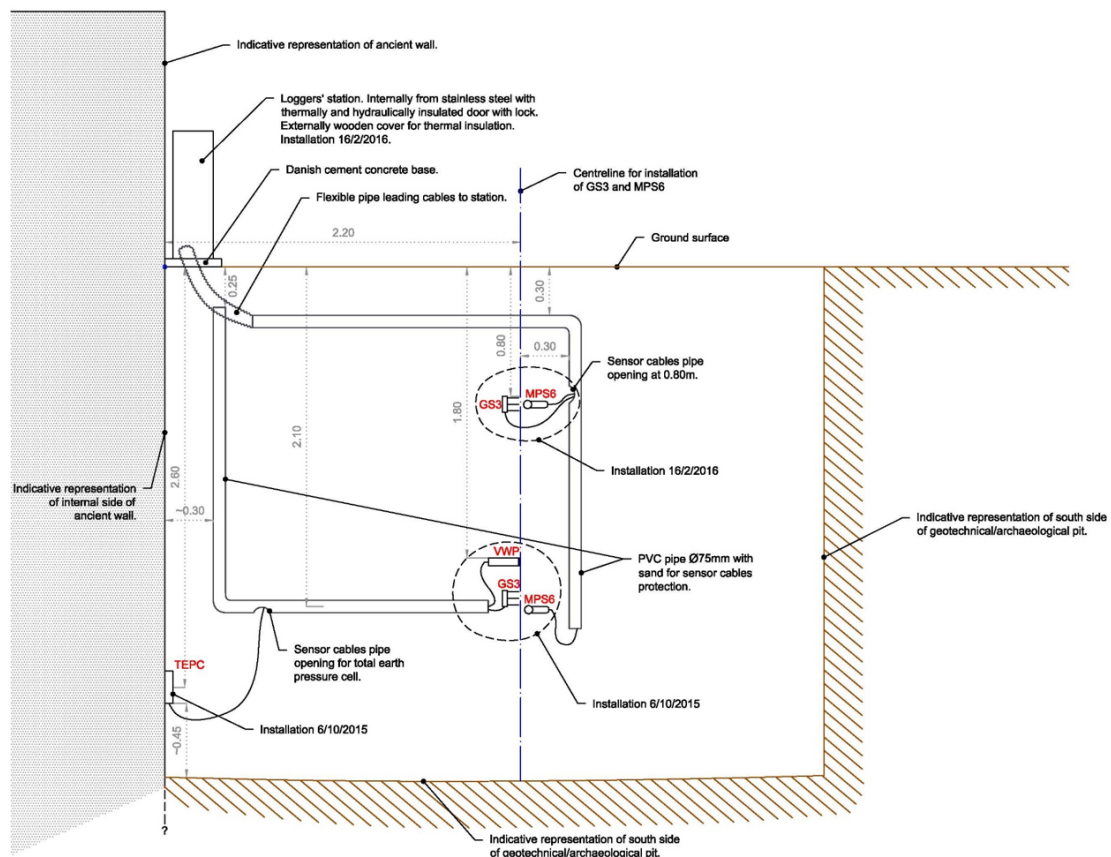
Layout of the instruments installed in the excavation pit adjacent to the North wall.
